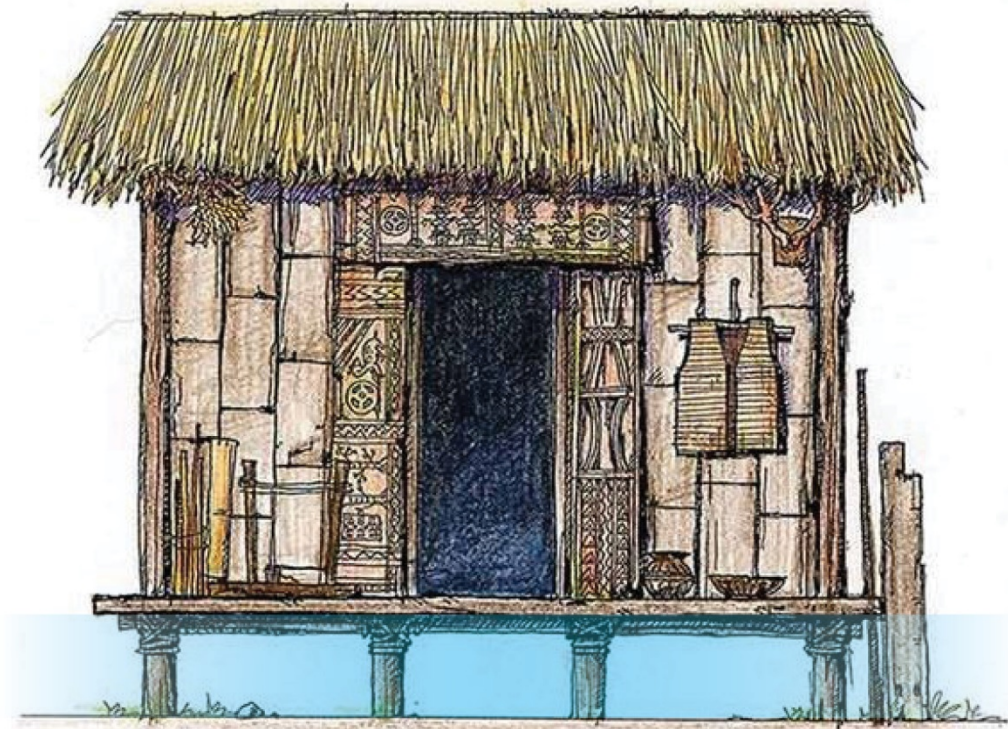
Kavalan stilt house, (A Reconstructional Study on the Thao and the Kavalan Traditional Dwellings and Their Display Planning and Design, Taichung, 2003)
